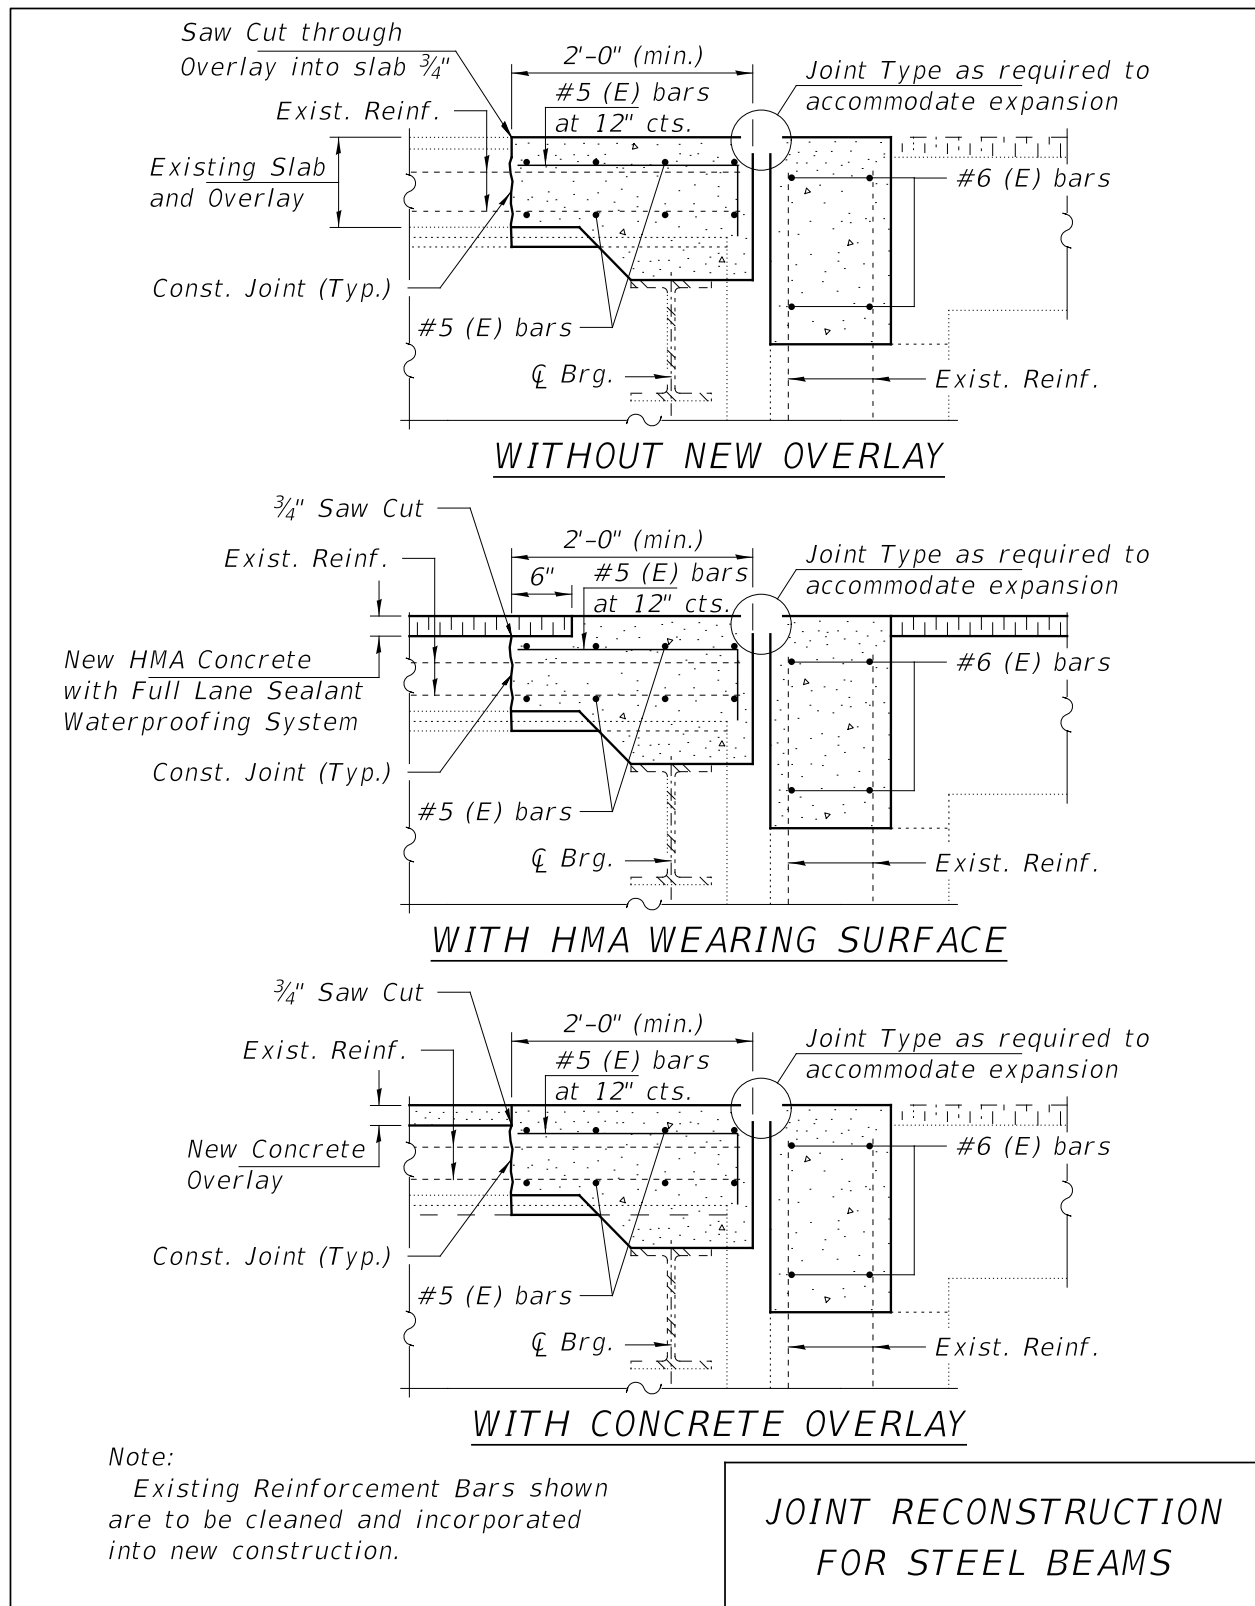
Joint Reconstruction for Steel Beams
